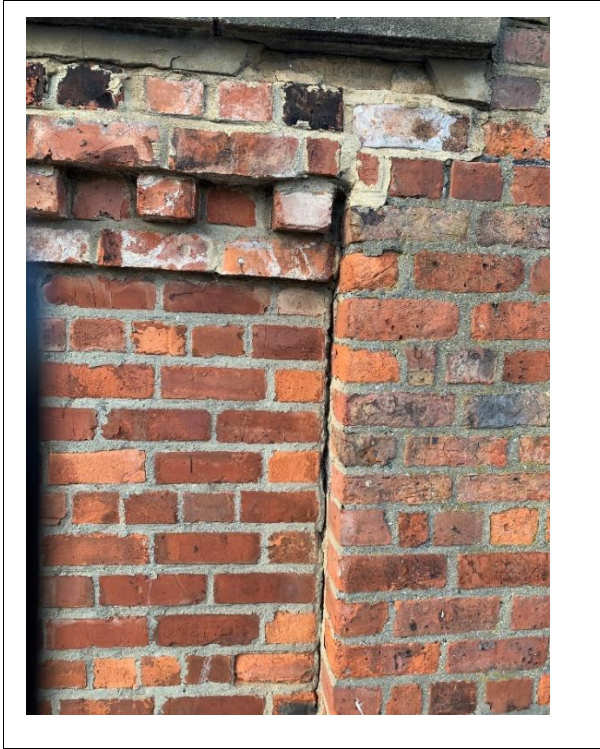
Wall Section 2, missing mortar to coping and brick repair to pier.
